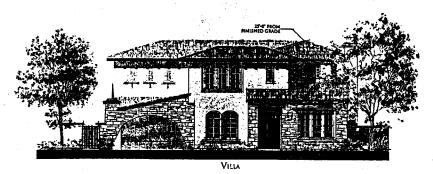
4-04-084 & 4-04-085 Model #3 Elevations
